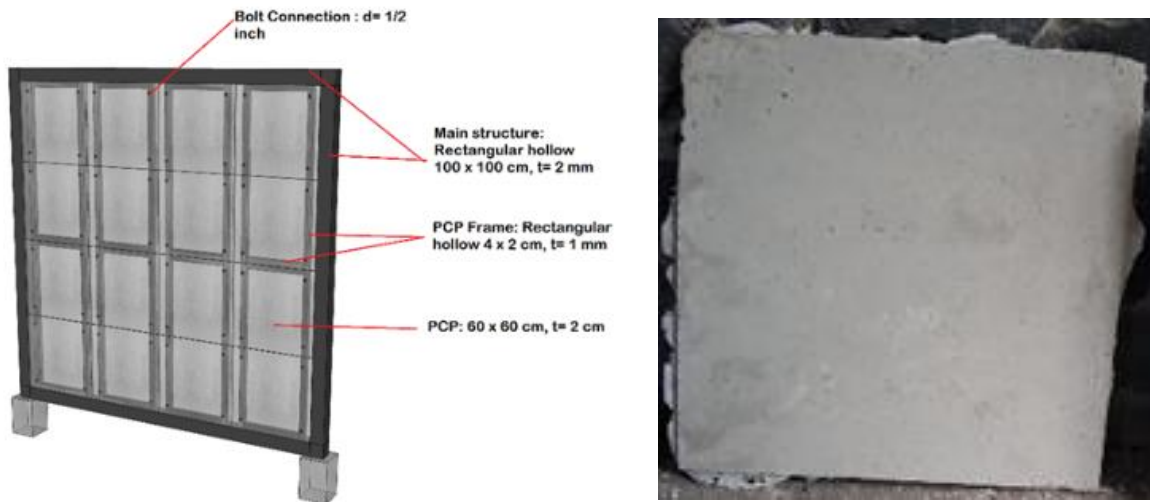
Alternative housing construction from galvanized steel and waste recycling for wall panel [304]
